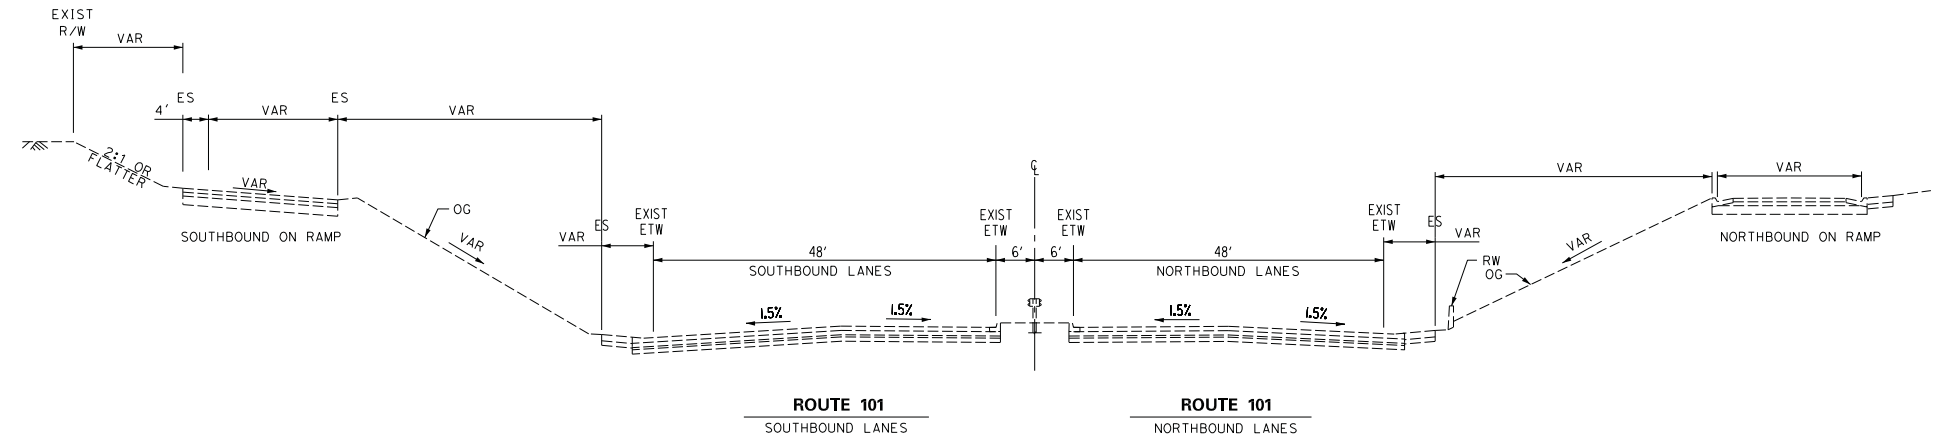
Existing Freeway Typical Section Between Santa Monica Boulevard and Romaine Street
